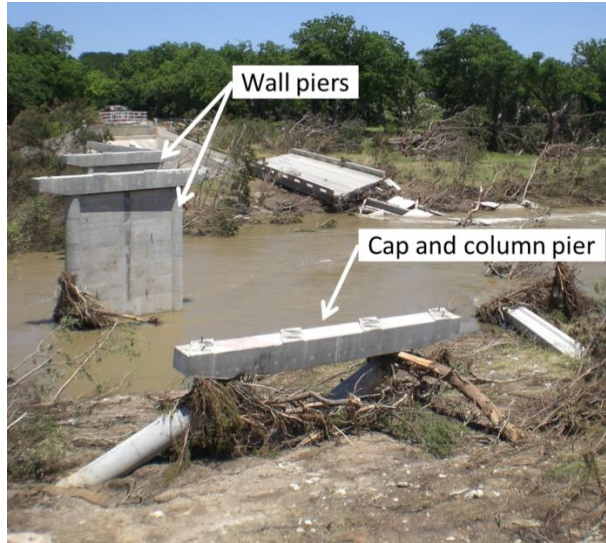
Fischer Store Road/CR181 Bridge (view from west abutment)
